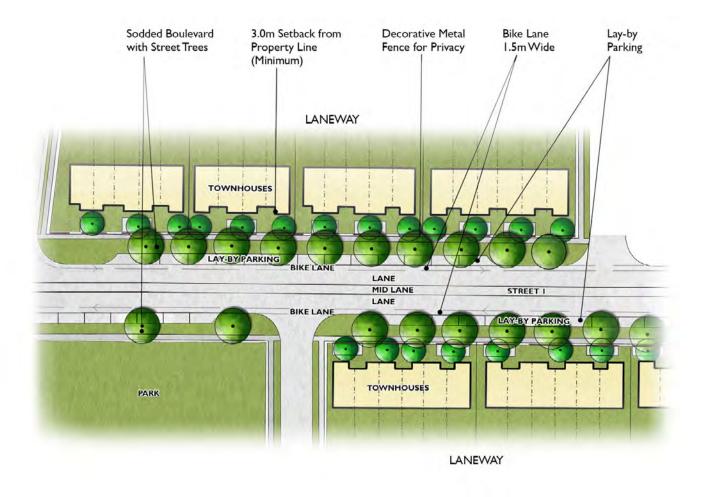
Rendered Illustration of a Laneway Townhouse Streetscape
